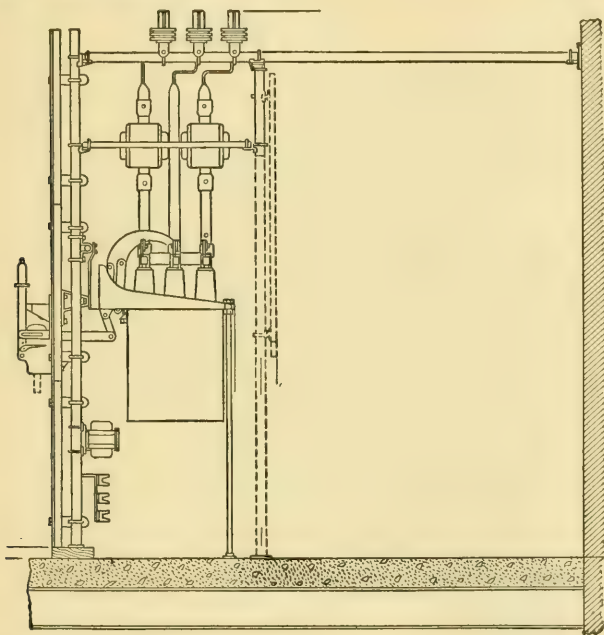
Arrangement of 2300-volt Switchboard with Circuit Breakers Mounted on the Pipe Work Supporting the Panels.
